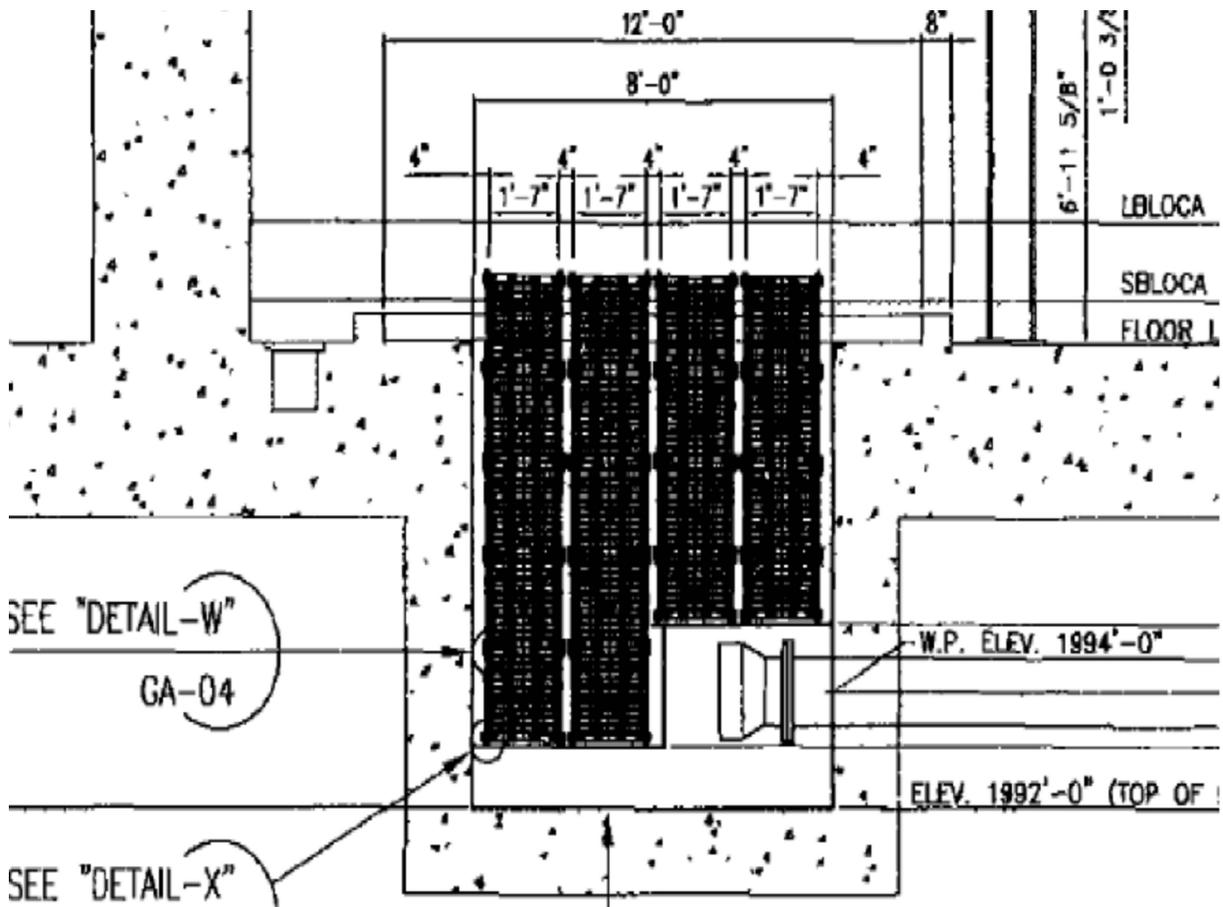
k-3: Drawing with Cross-Sectional of Strainer
